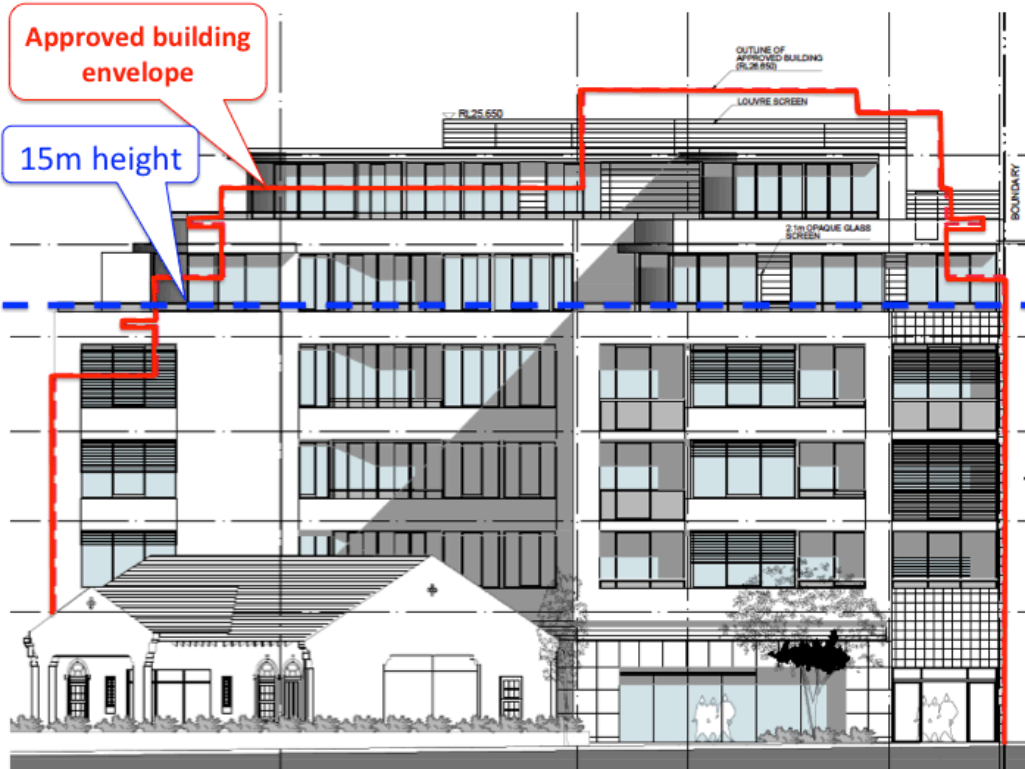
West Promenade Elevation – approved building envelope shown in red
